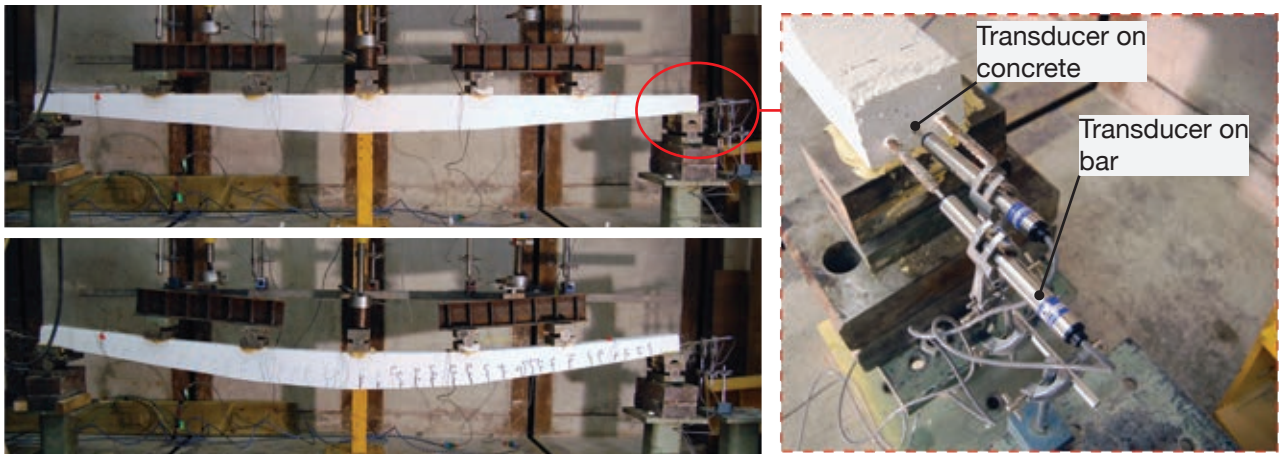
Beam 8\_1a (transducers placed at both ends of the Beam).
